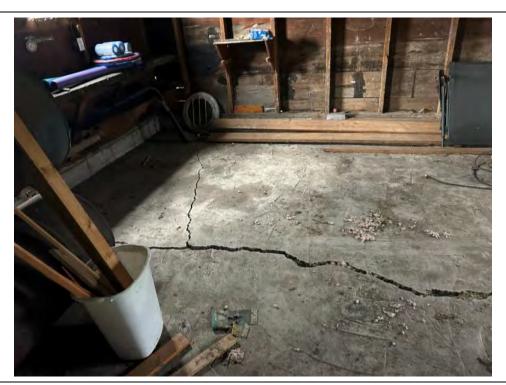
View of interior storage in steel sided shed, south of residence garage.
